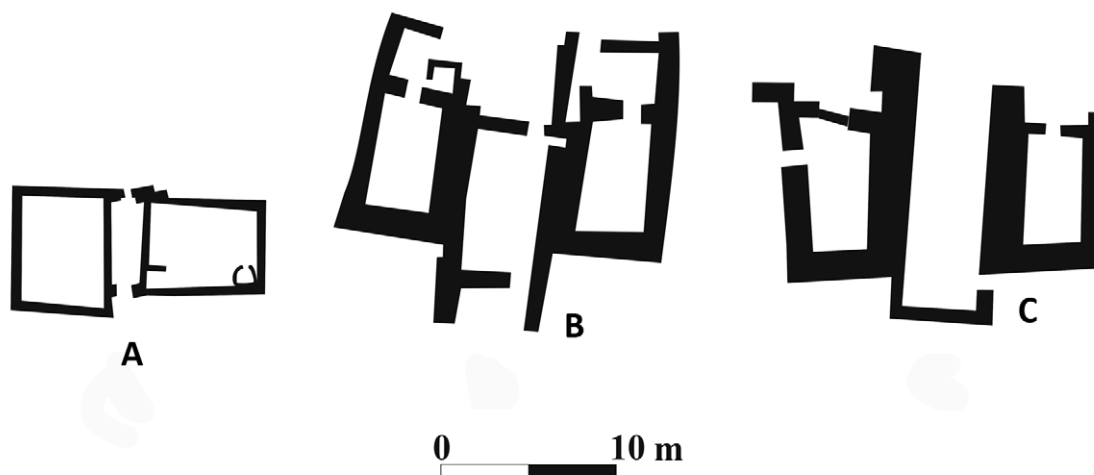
A. Plan of the Eastern Gate at Kuruçay (Kuruçay excavations – archive); B. Plan of the Western Gate at Hacilar Büyük Höyük; C. Plan of the Southern Gate at Hacilar Büyük Höyük (B & C – Hacilar Büyük Höyük excavations – archive)
